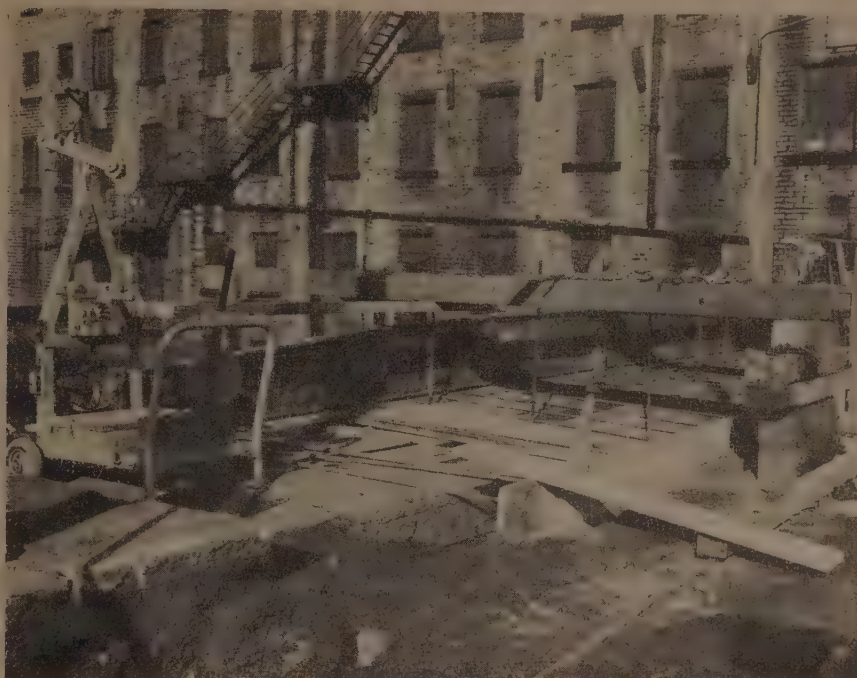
Cast iron beam bridge, strengthened by prestressing with high tensile bars
